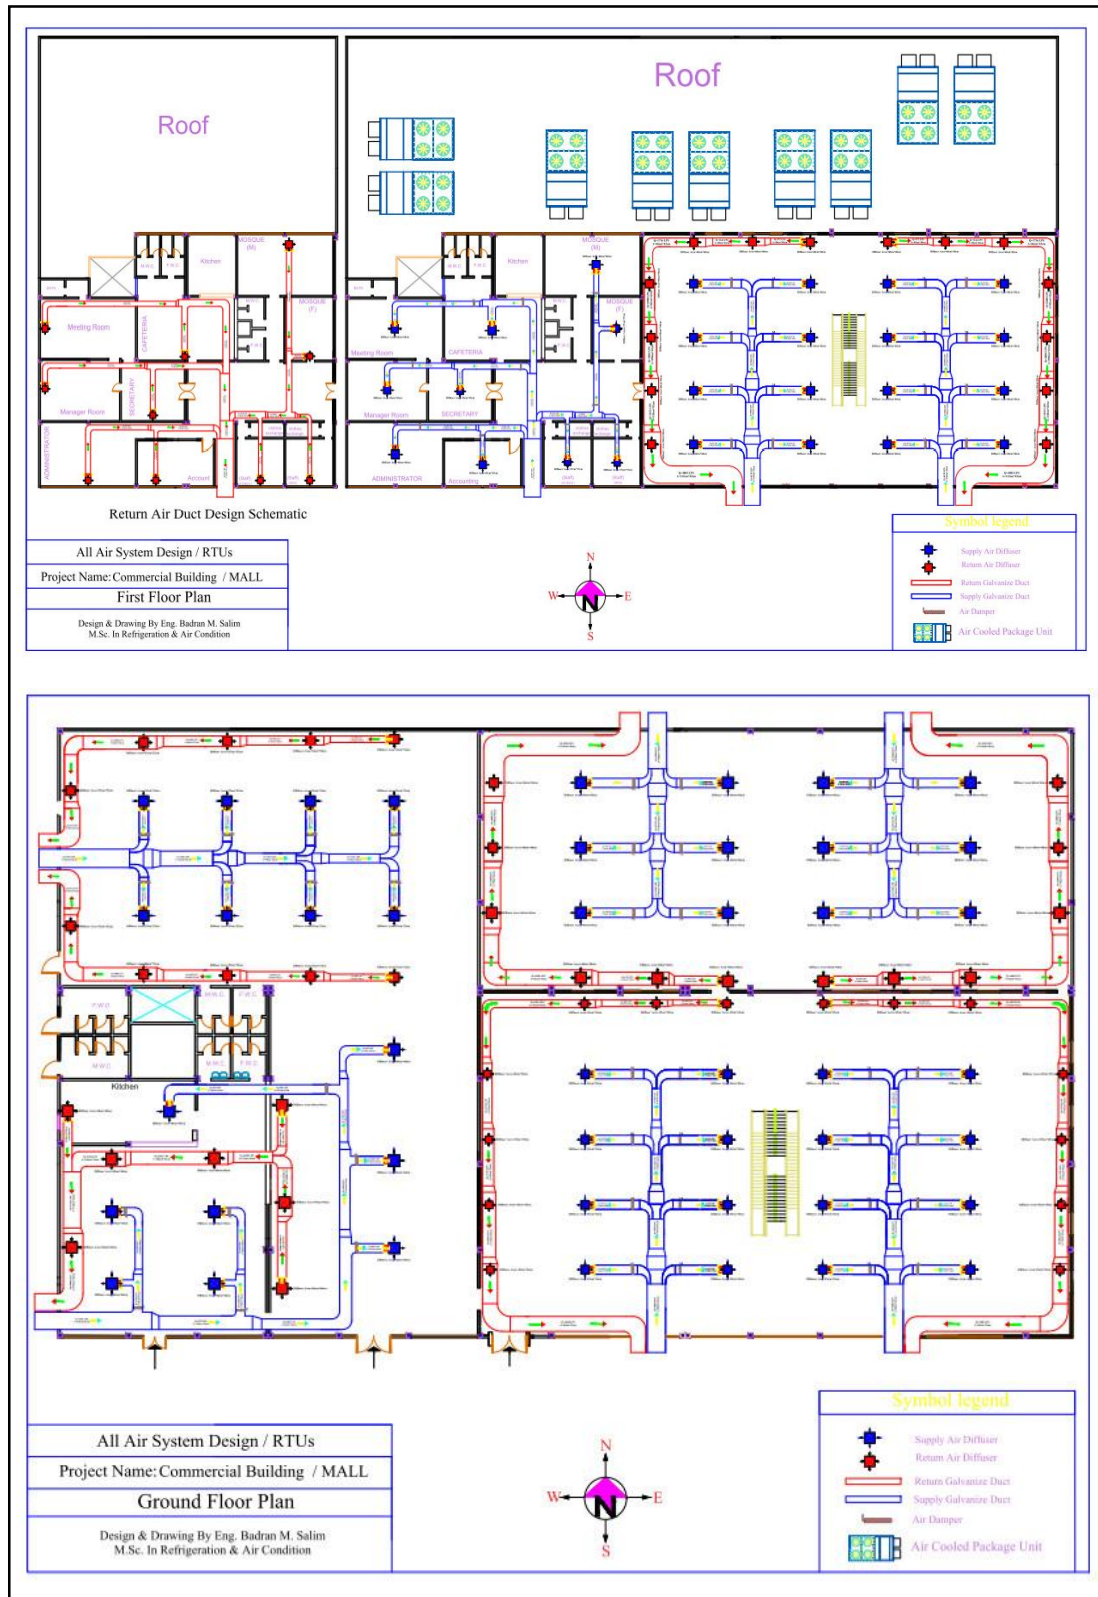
RTU Air Conditioning System Design and Terminal Distribution for Ground and First Floors of the Mall Building
